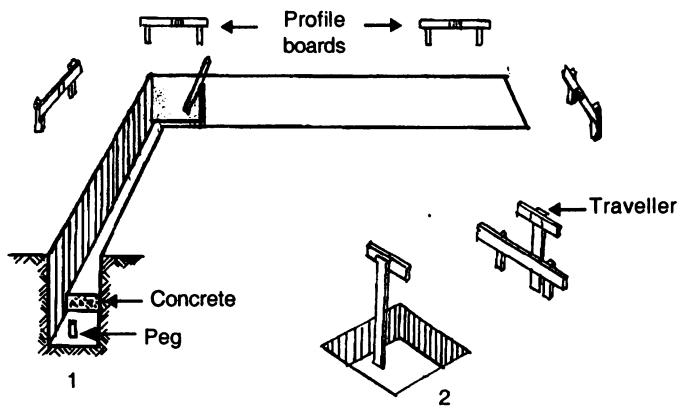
Determination of depth of excavation by boning rod or traveller and profile boards: 1. Strip foundation, 2. Column footing.
